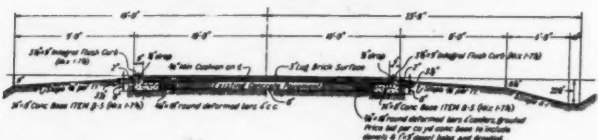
OHIO HIGHWAY DEPARTMENT (Route 73)
